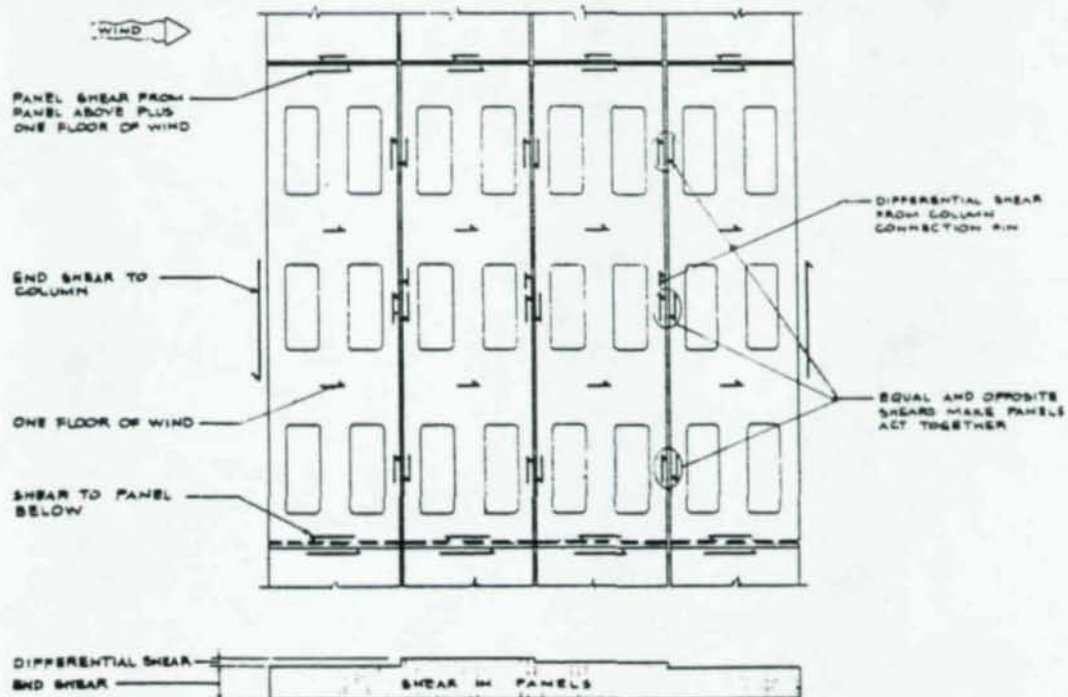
Forces Acting on Cladding Panel from One Mellon Center
